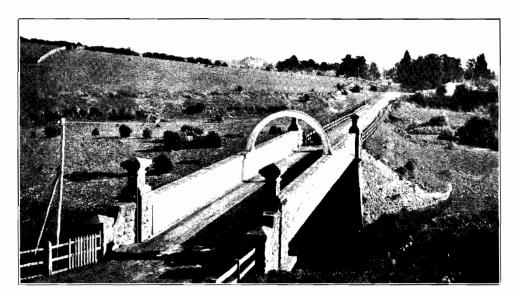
Shire of Keilor. Bridge on main Bendigo-road; erected by Keilor District Road Board, 1868.
